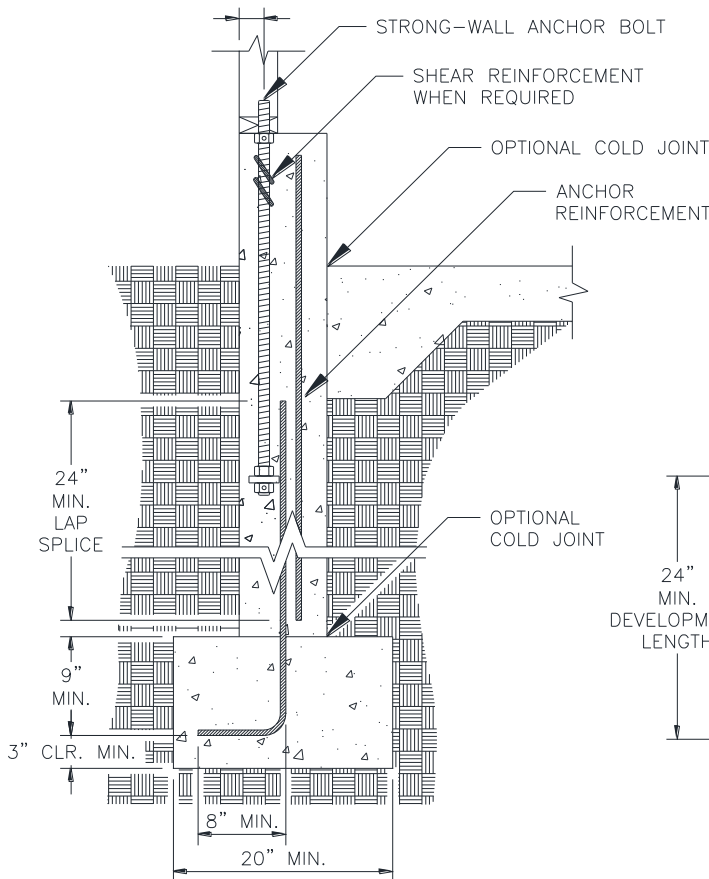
Strong-Wall at Edge of Concrete with Lap splice – Section (Flush to Inside Face of 2x6 Wall Similar)
